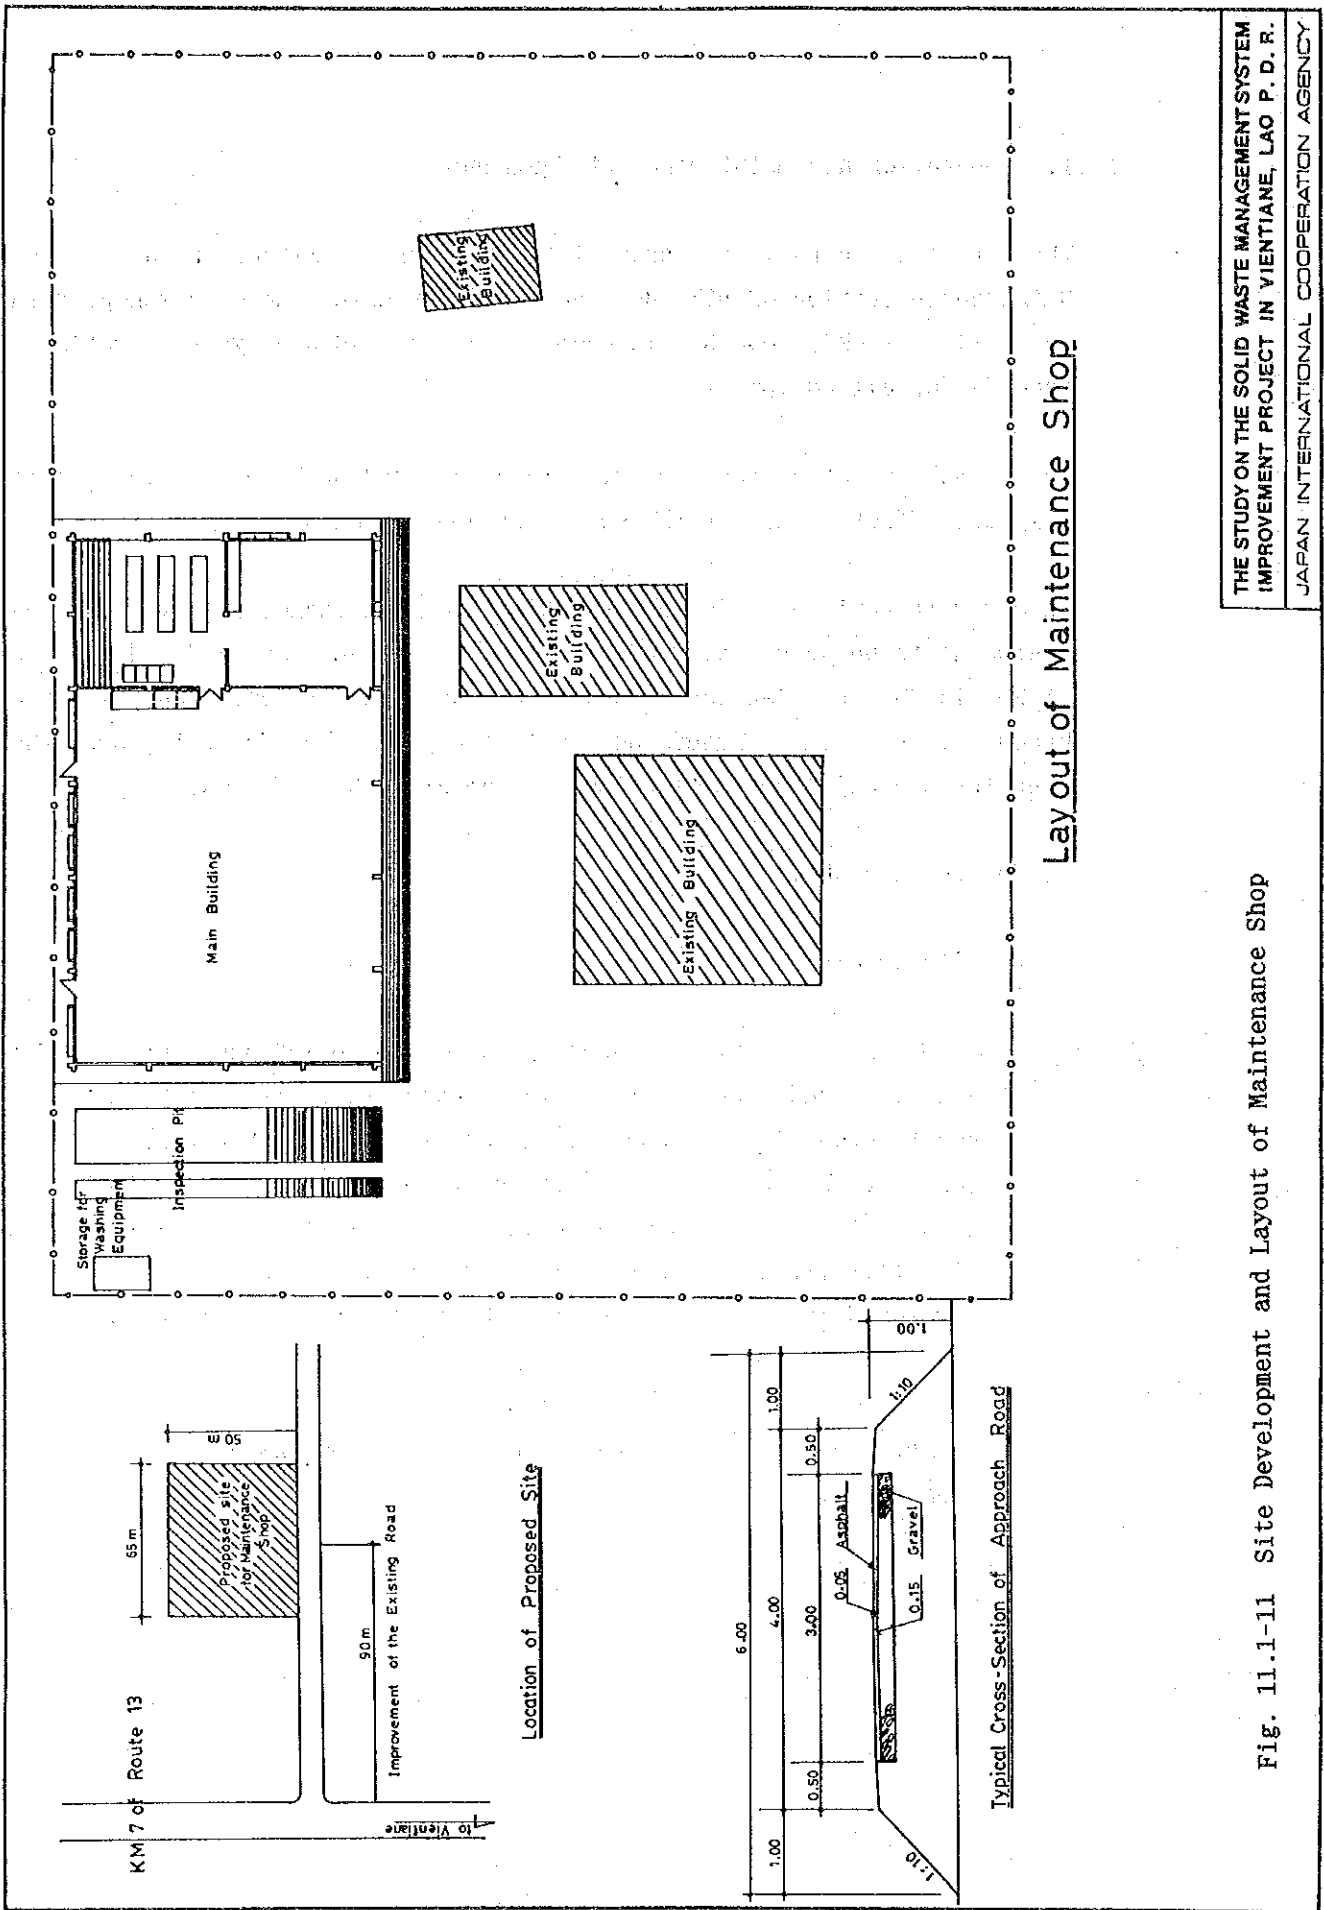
Site Development and Layout of Maintenance Shop
